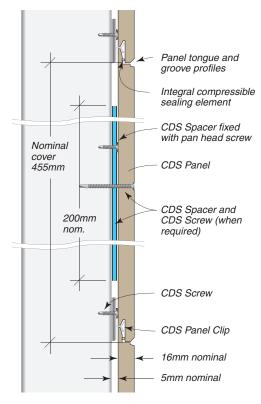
Typical System Cross Sectional Detail where Face Fixing is required – Steel Frame – Elevation
